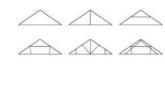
Attic structure in Sheki buildings are entirely or partially made of wooden joists, rafters, and tie beams.
